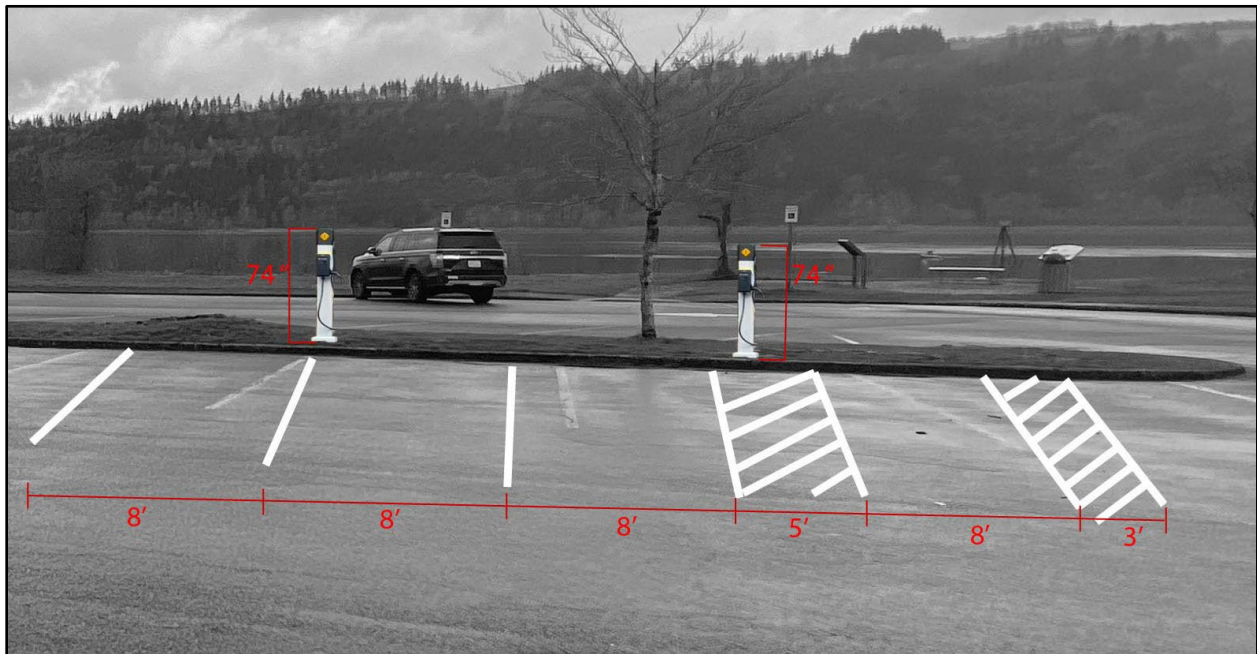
Above is a digital mockup of the proposed Electric Vehicle (EV) charging stations and parking stall striping.
